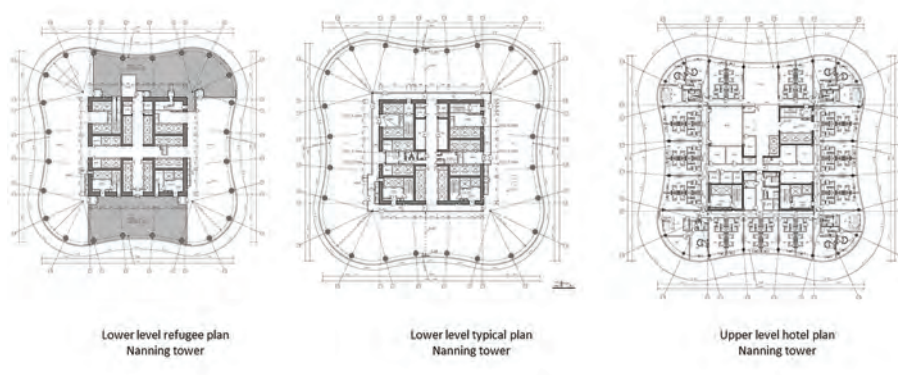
Nanning Tower plan (Source: Yu Wang, THAD)
